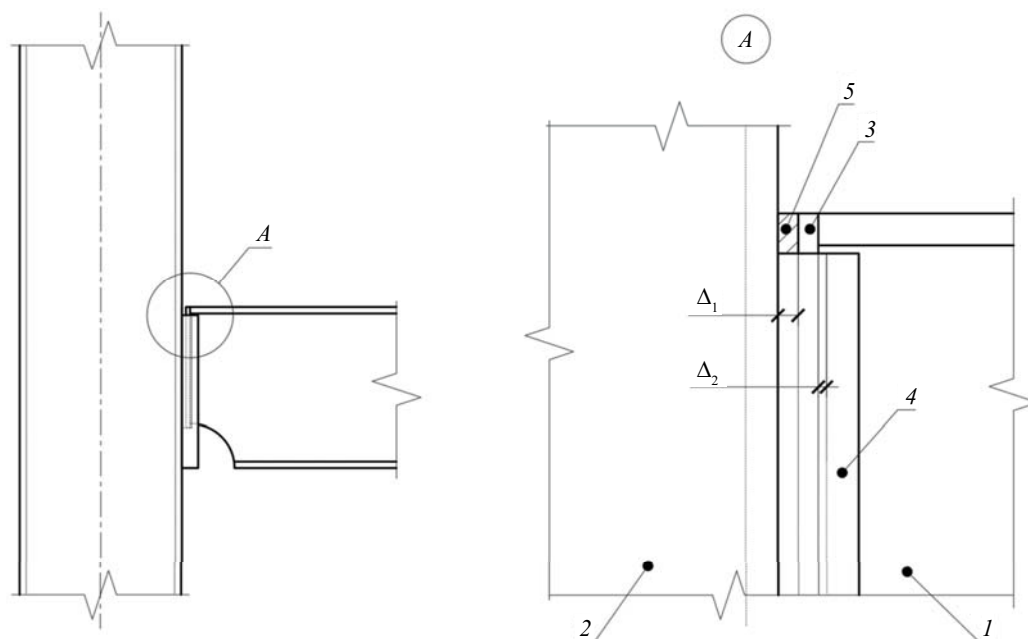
Gaps in the joint: 1 — beam; 2 — column; 3 — support rib; 4 — support socket; 5 — shim plate
